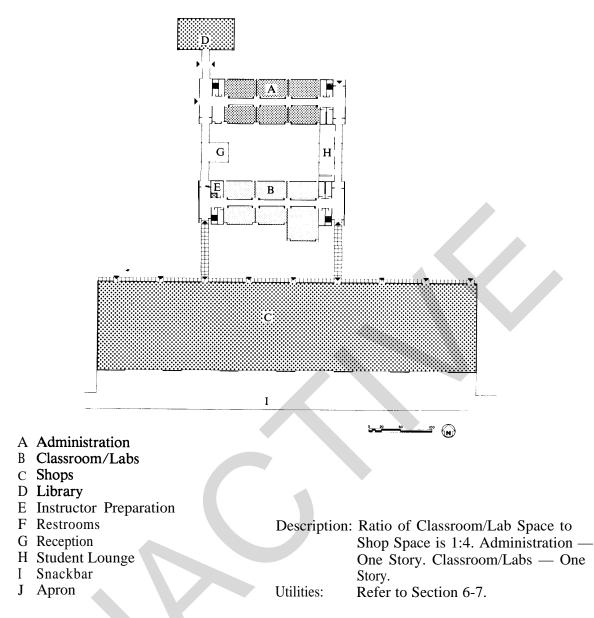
Illustrative Plan, 150,000 Sq. Ft. School (Primary Instruction Space; Shop).
